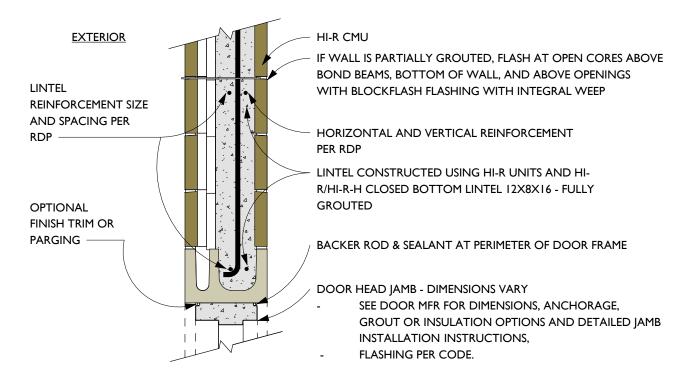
HI-R - Door Head - HI-R Stretcher Used for Lintel
